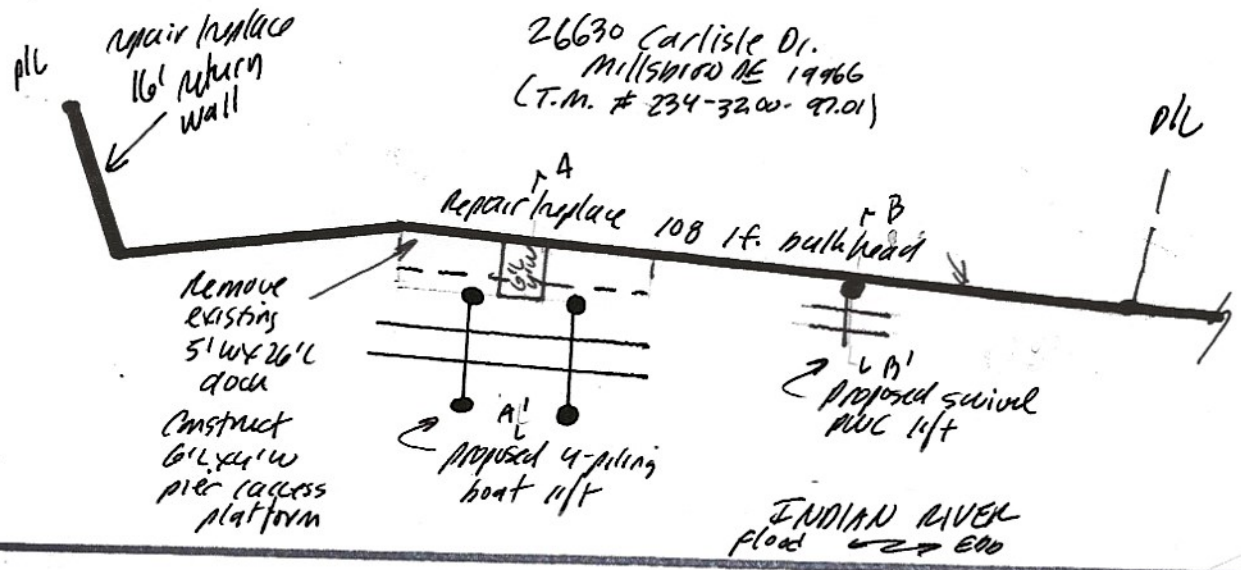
Plan view sketches of proposed project. Sketches for permit application purposes only.
